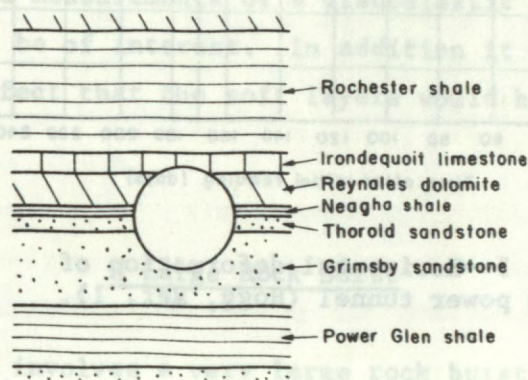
Geological section at elevation of power tunnels (Hogg, Ref. 1).
